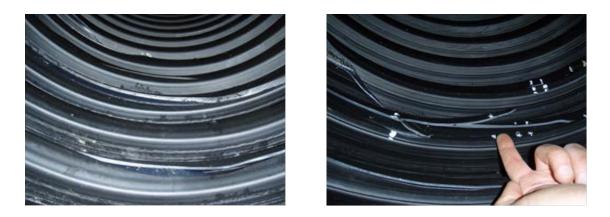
Cracking Discovered under Couplings (Goddard 2008)
